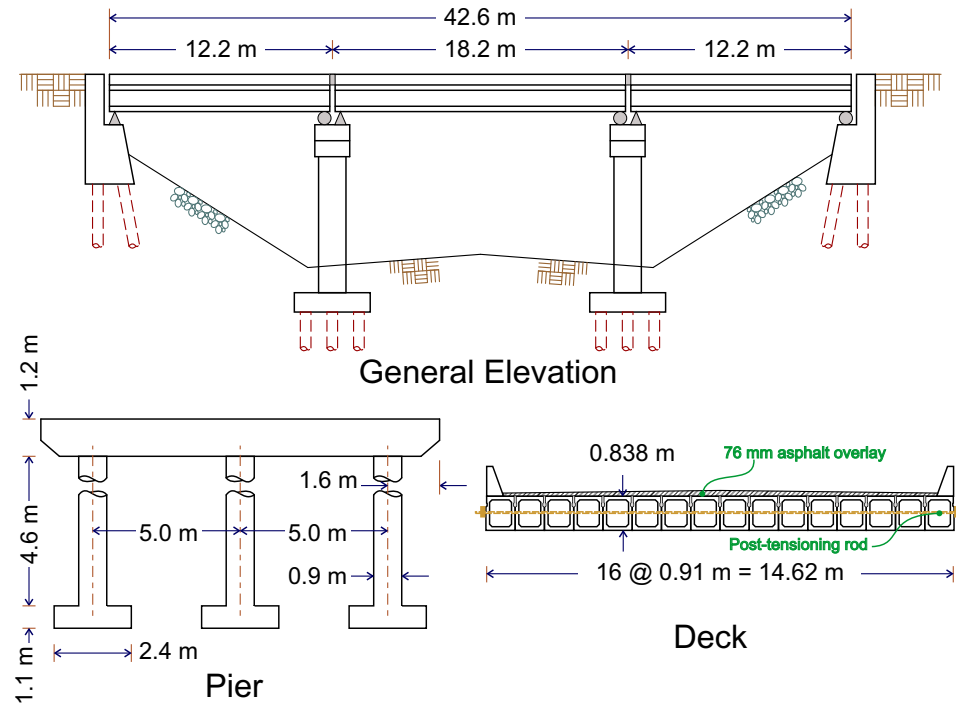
MSSS Concrete-Box Girder Bridge Configuration.
